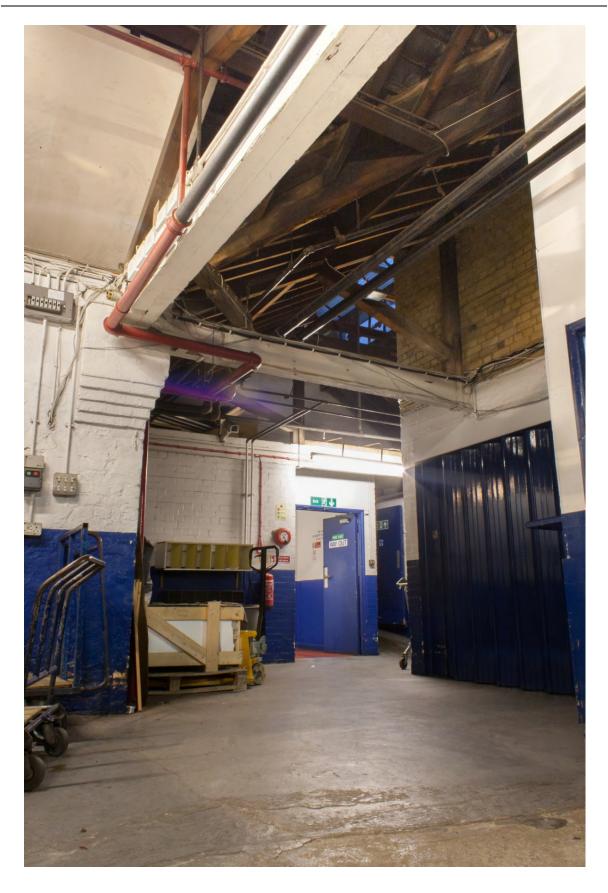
Entrance into the first floor storage area on the north side of the building, showing roof structure and 20th century brick partition walls, looking south (72FmLa D100 058)
